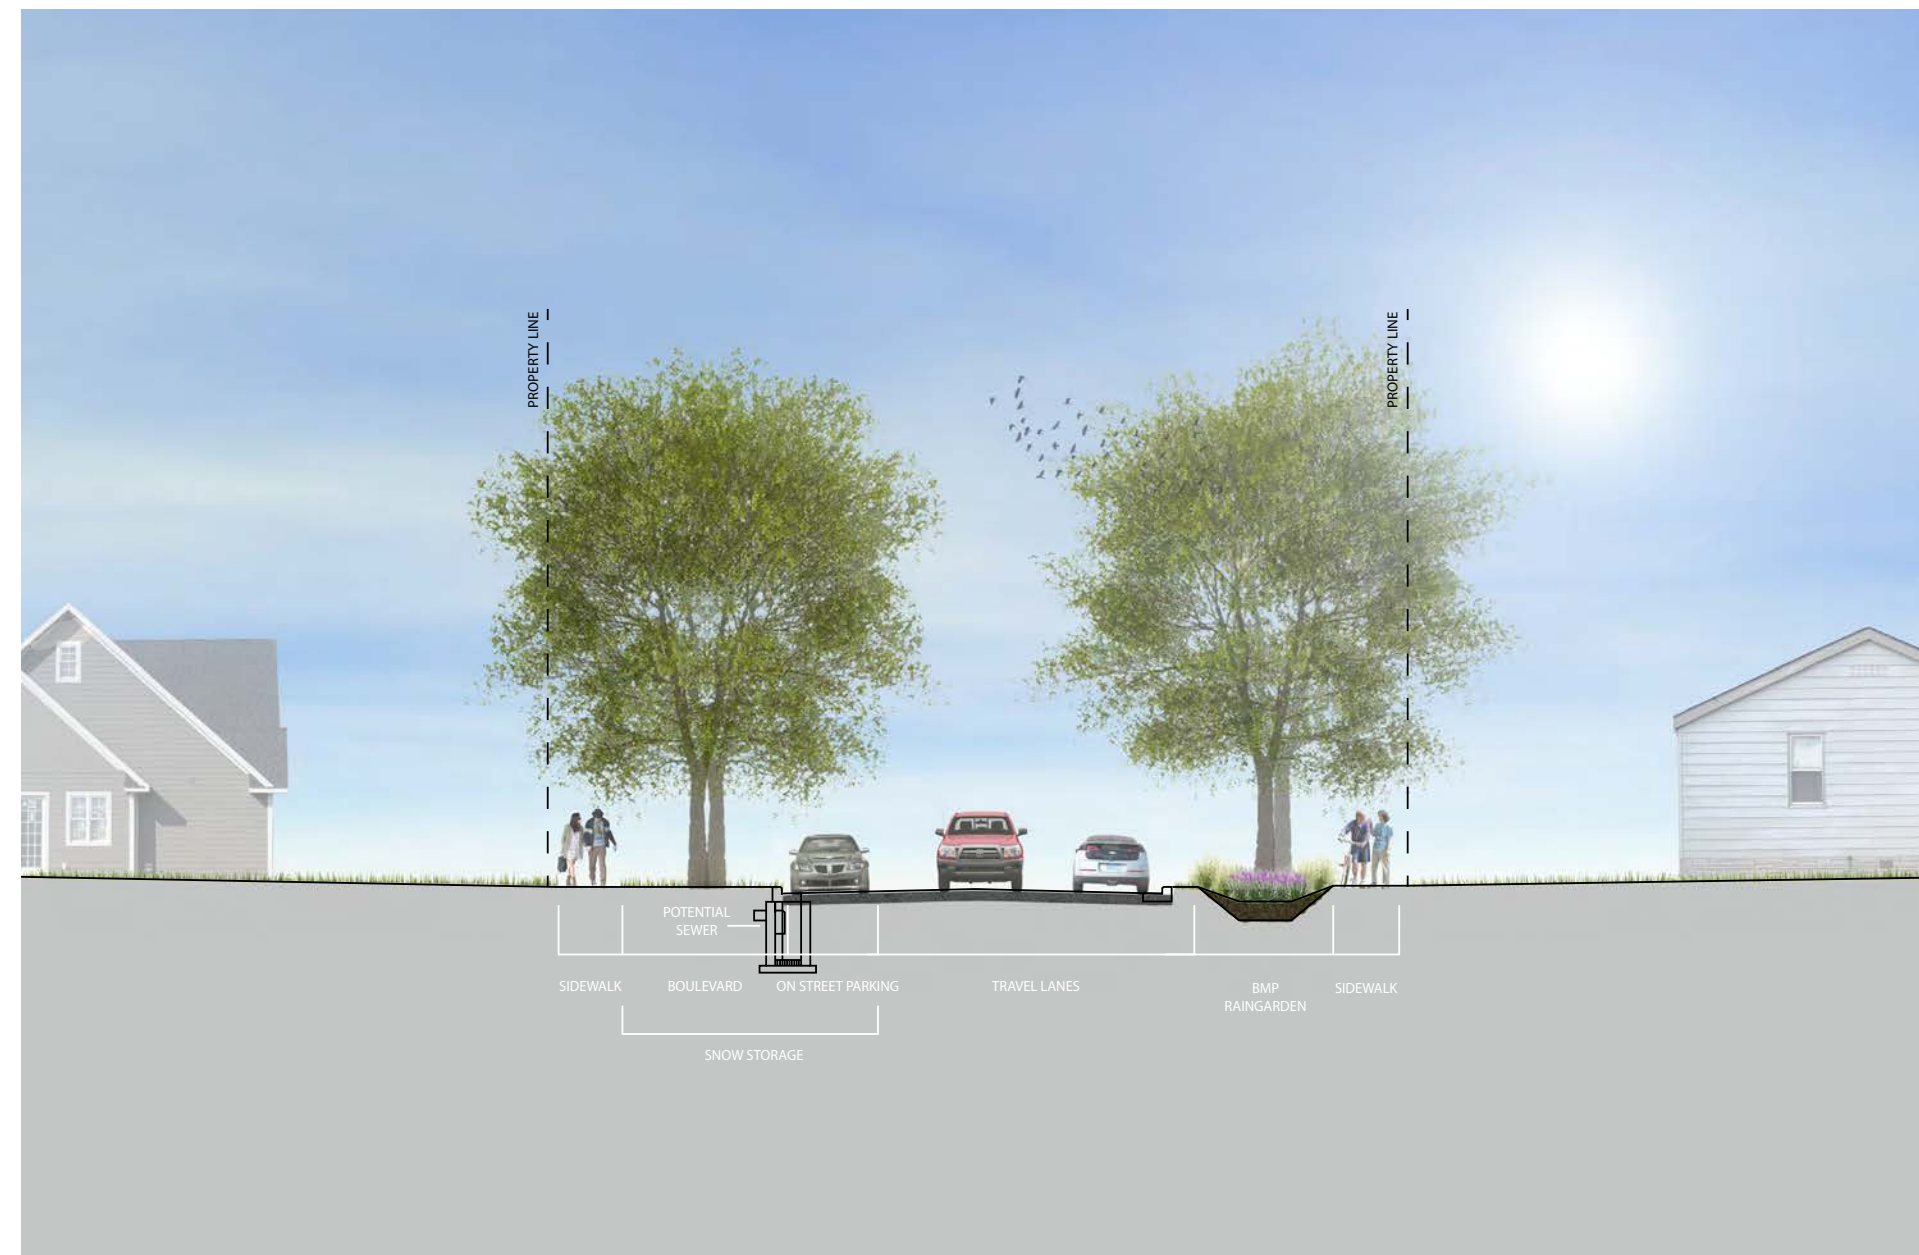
Proposed improvements to typical study area street (100 block of Brent Street)
